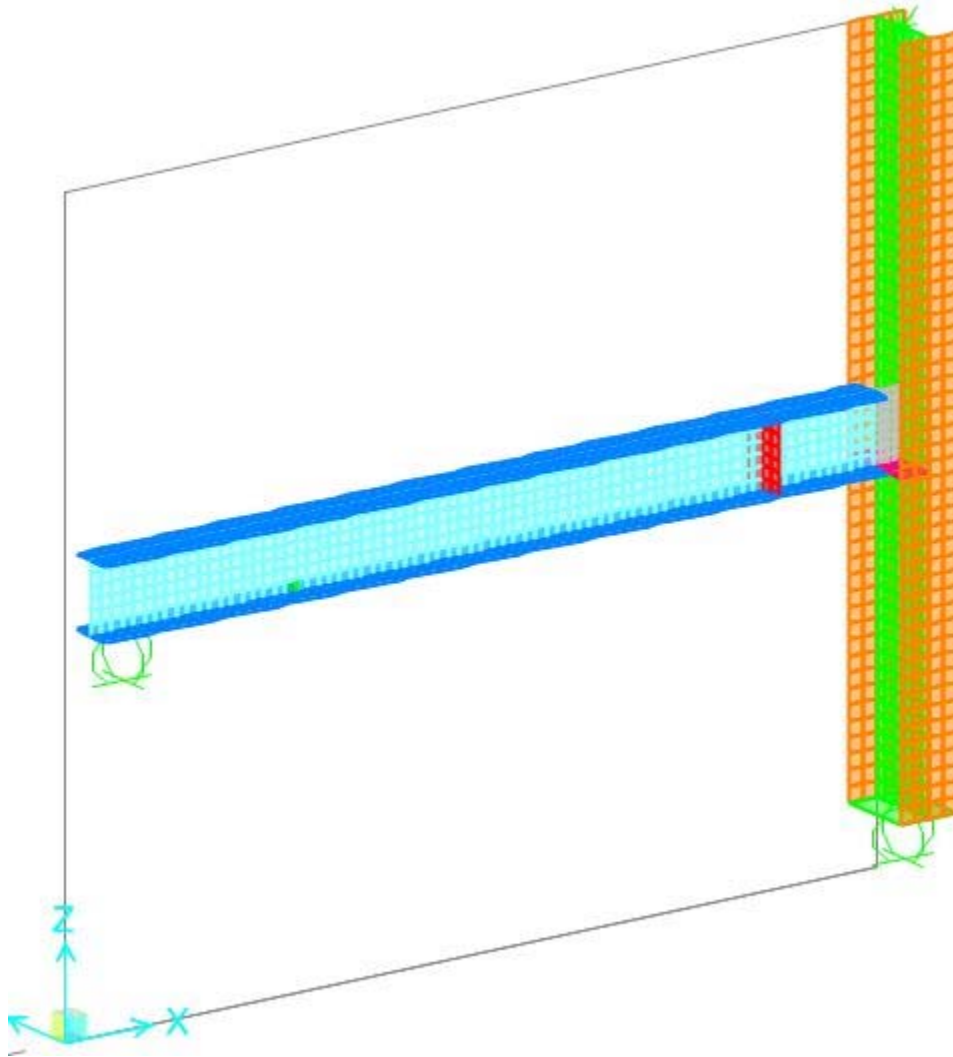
Test 5 Shell Model 2 with Bottom Column Stiffener Only
